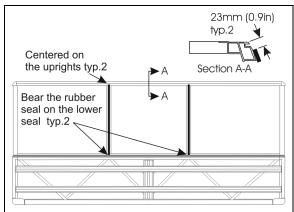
FACE FIXED WINDOWS - RUBBER SEAL INSTALLATION
